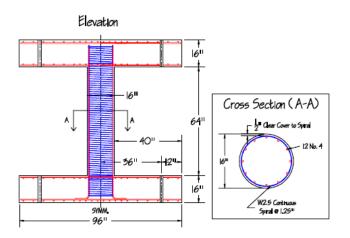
Column dimensions and reinforcement details (reprinted from Hachem et al. 2003)
